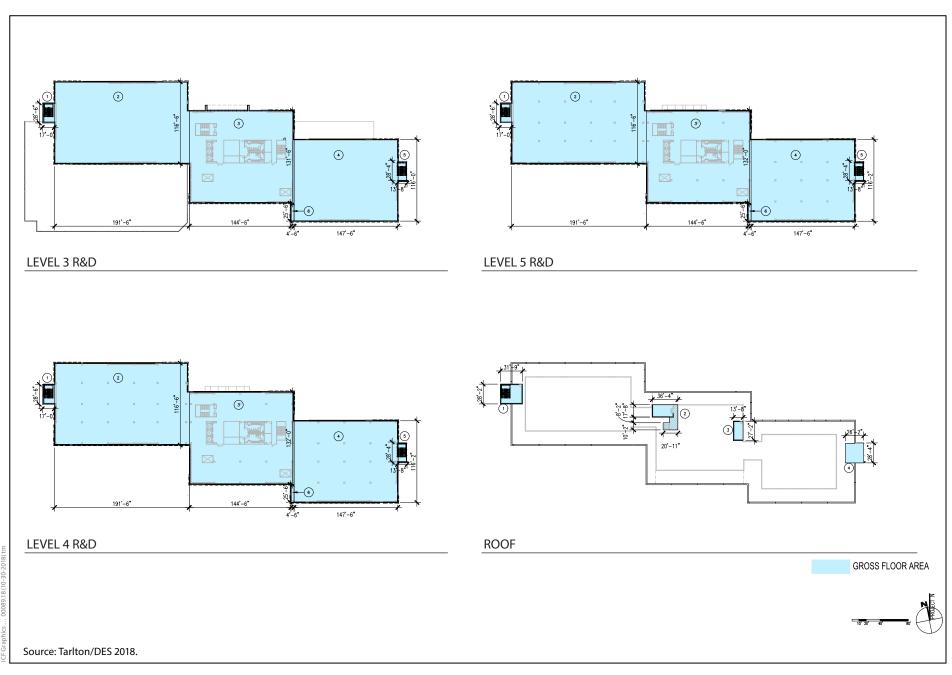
Site Plan by Floor (Level 3 R&D through Roof) 1350 Adams Court Project
